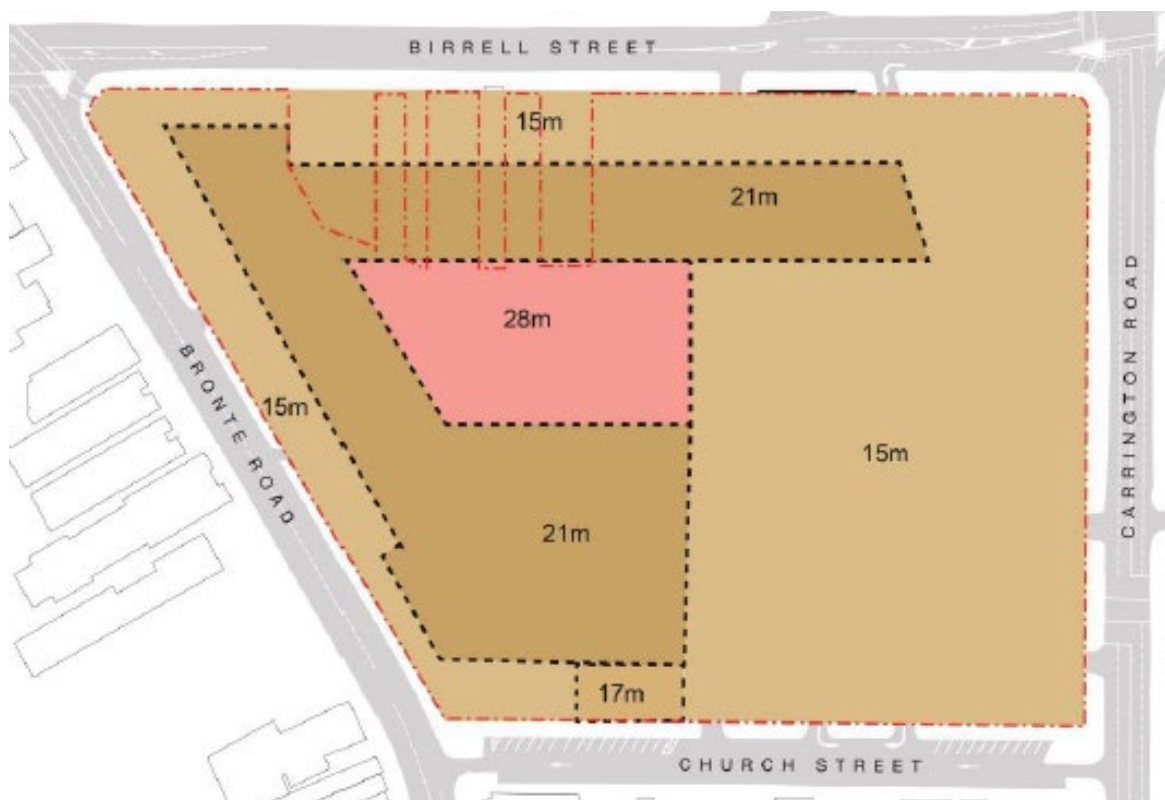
Revised height envelopes proposed under the first amendment to the planning proposal
